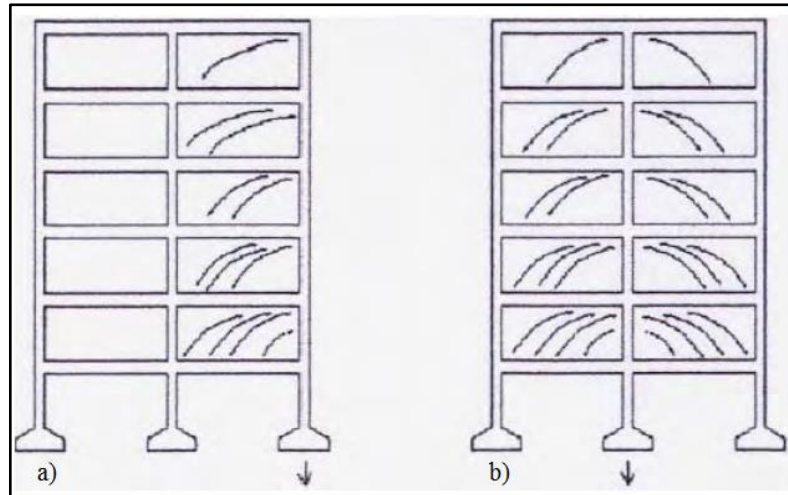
Cracks induced on partition walls of reinforced concrete building by differential settlements: lateral settlement (a) and central settlement (b) (from Menditto, 2010).
